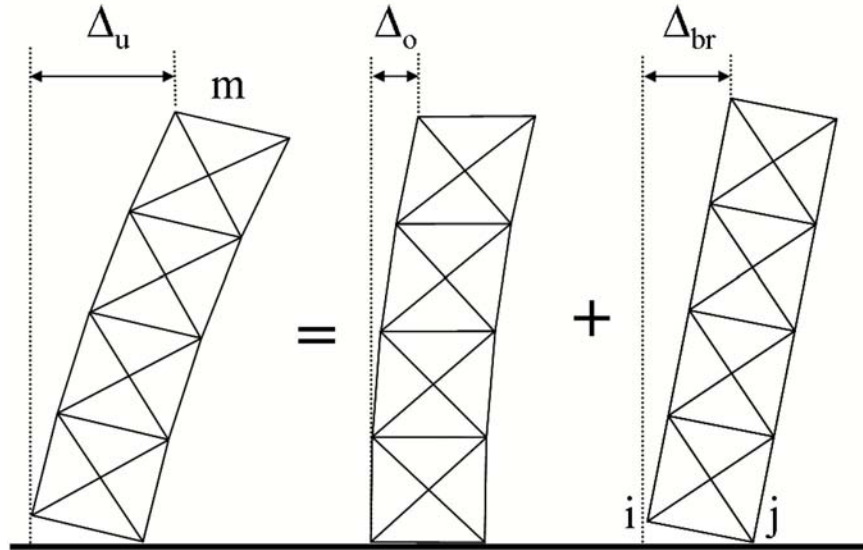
Kinematics of Controlled Rocking Truss Pier
